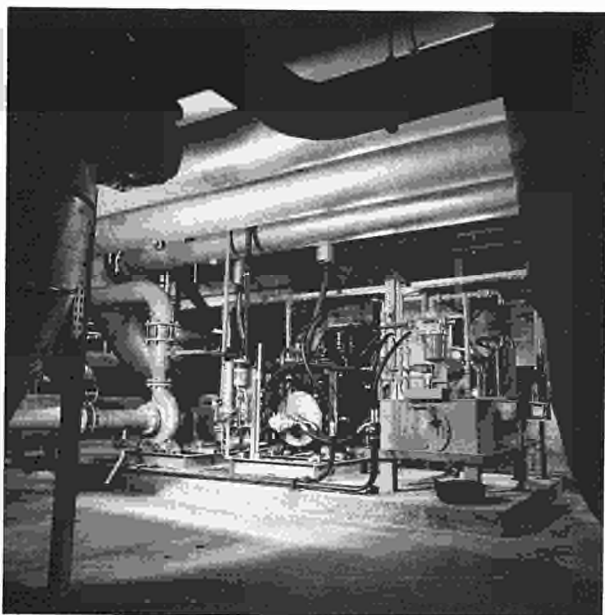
Diesel engines in the valve pit for the emergency cooling system.
